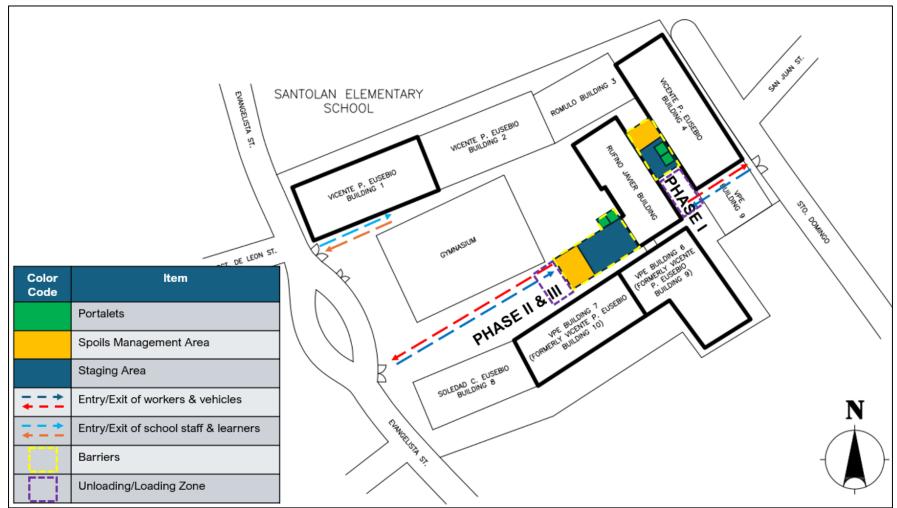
Proposed Staging Area and other Support Facilities in Santolan Elementary School
